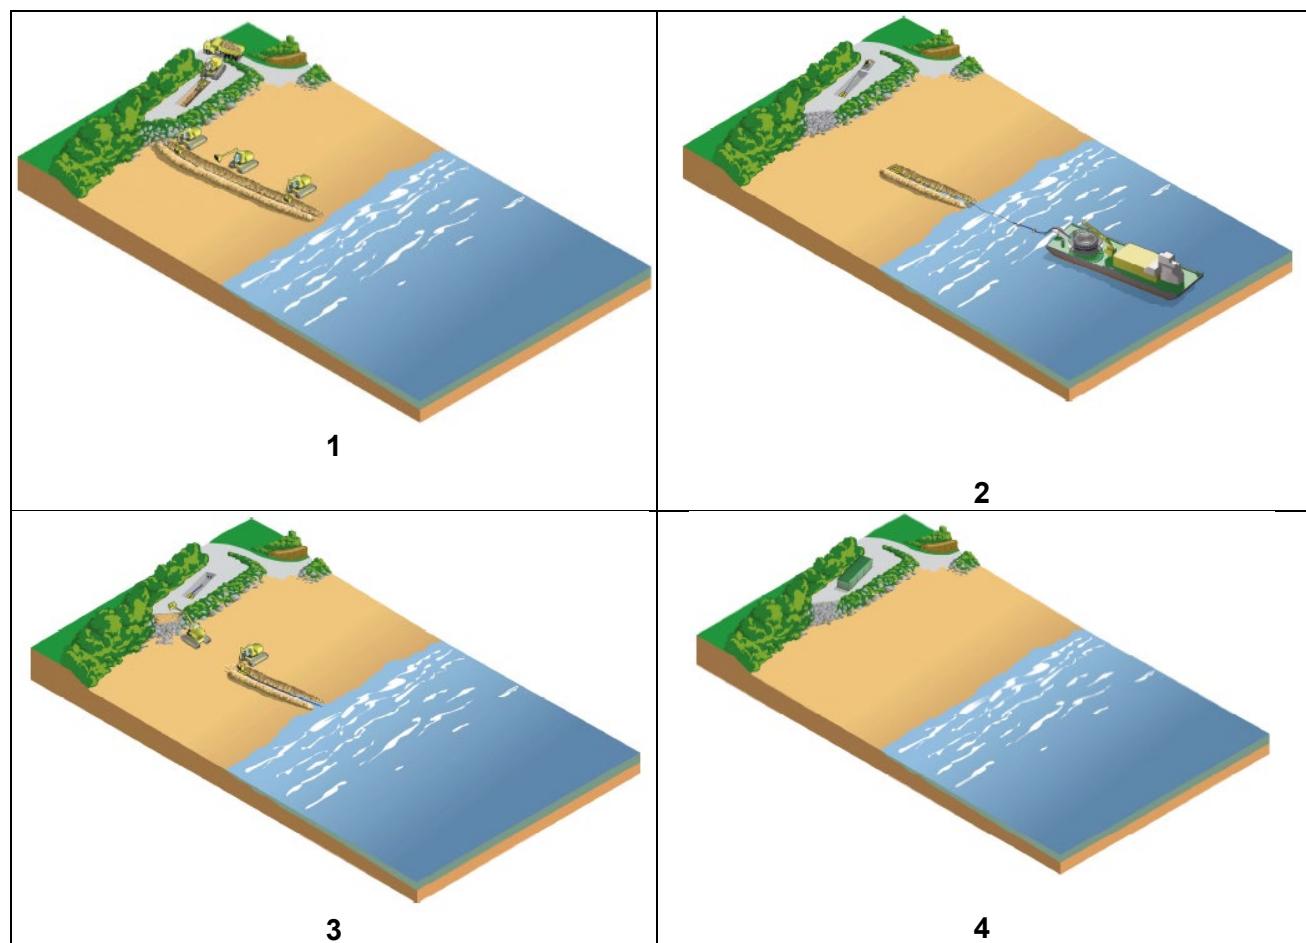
Typical Scenario of Installing a Cable Trench at Landfall Location
